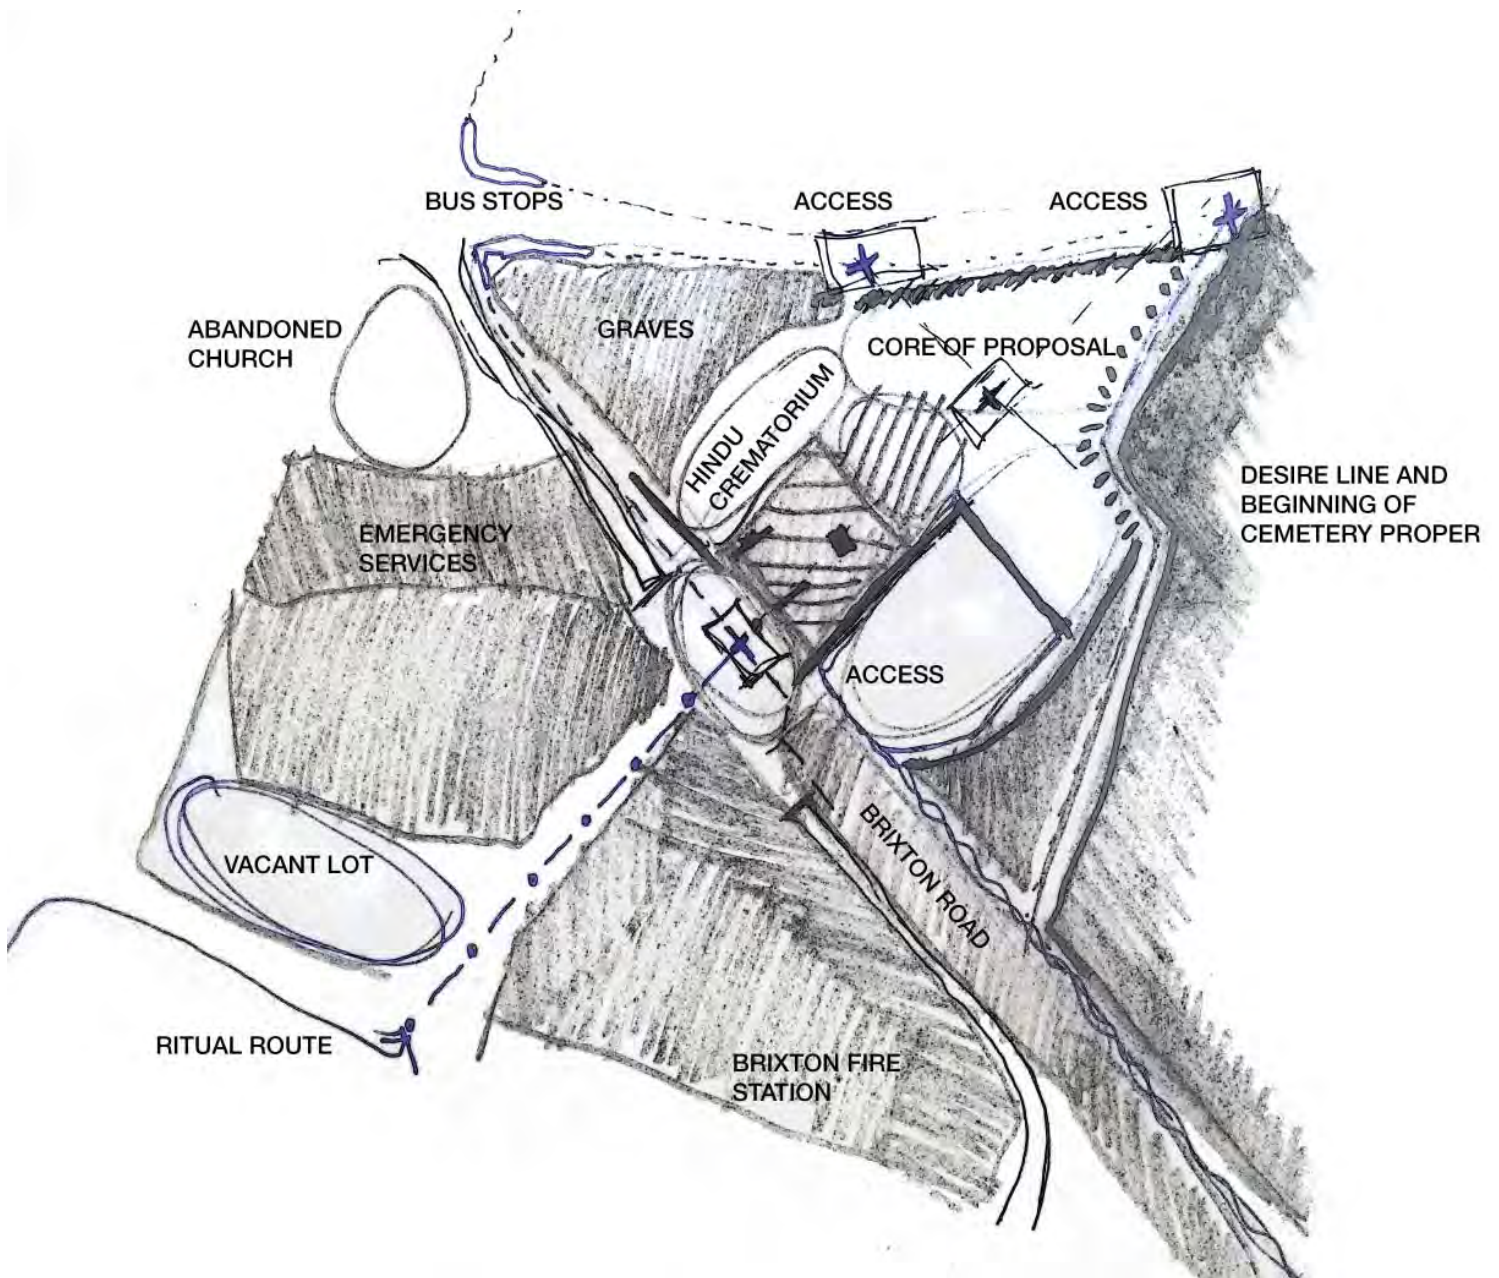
Site Areas, Route and Threshold Sketch (Author)
